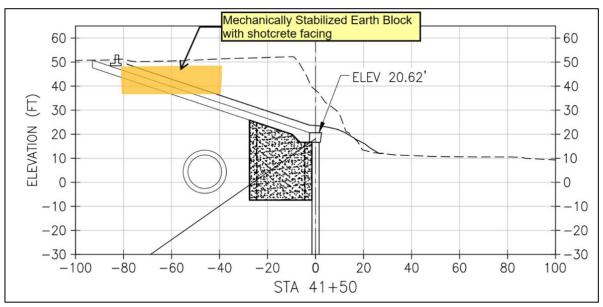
Cross-Section of MSE (or Similar) Wall Location along the SSL in Relation to Low-Profile Wall and Top of Bluff (Park Area)
